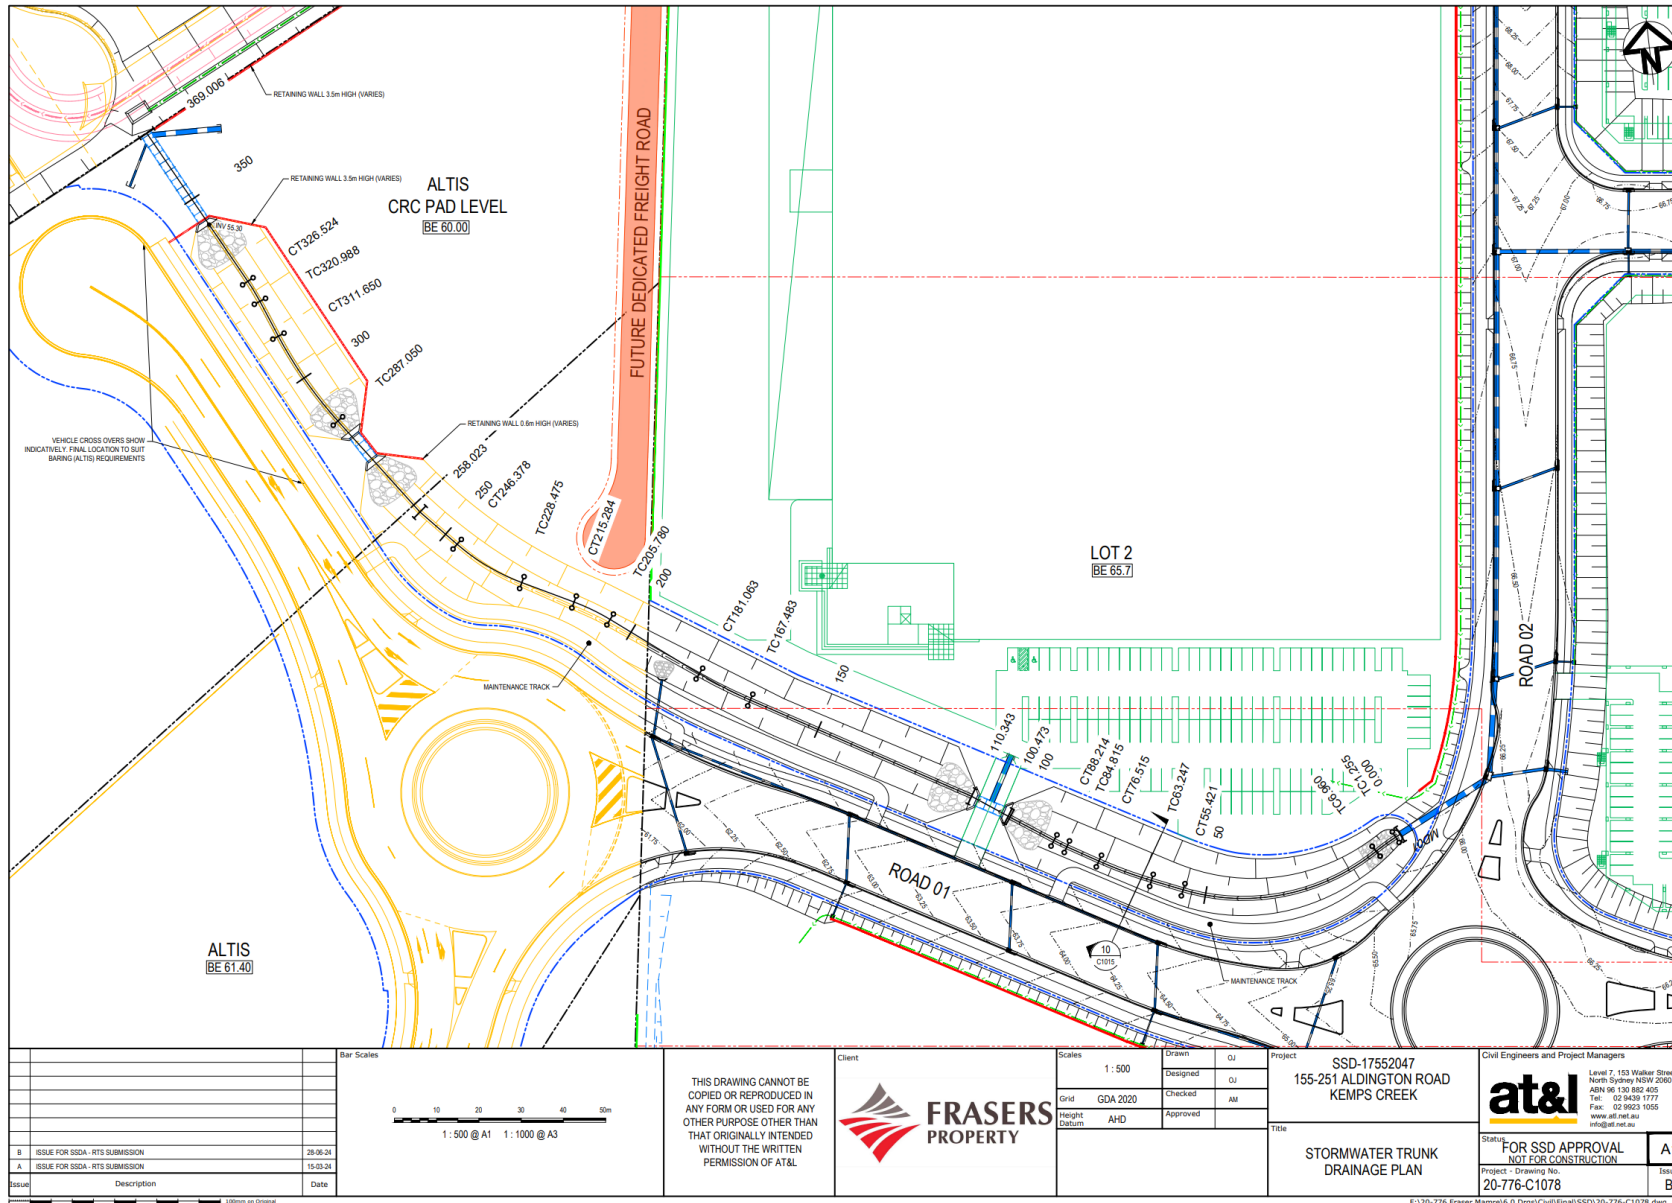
Proposed Naturalised Trunk Drainage Channel to the south of Warehouse 2
